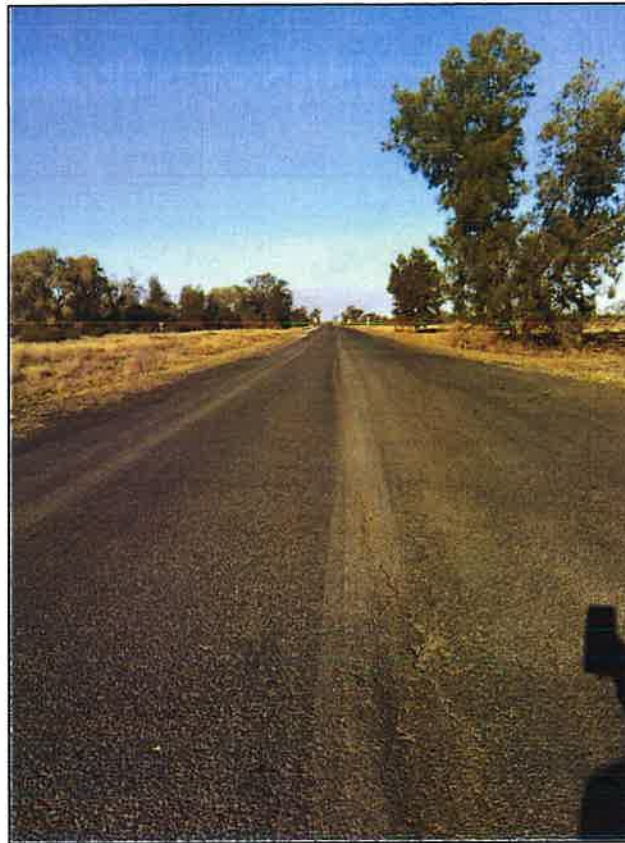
Croppa-Moree Road - Cracking down centre of road
